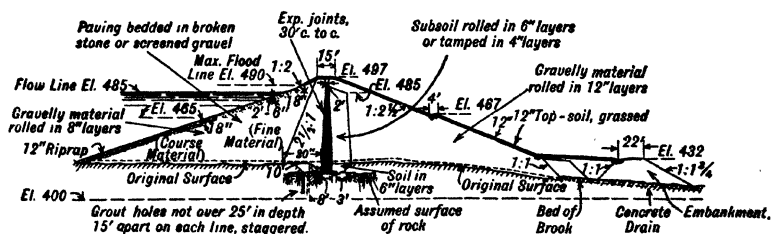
Cross-section of Phelps Brook Earth Dam for Hartford, Conn., Waterworks. Built in Rolled Layers.\
